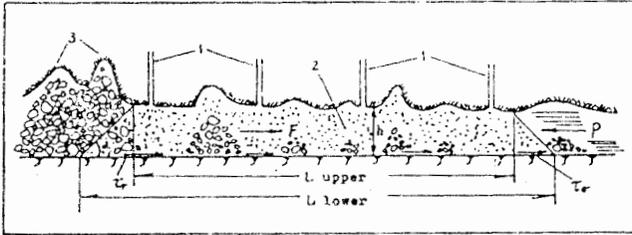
Sketch showing designed length of the cement-grouting section for water-blocking under water in leading coalhead.
